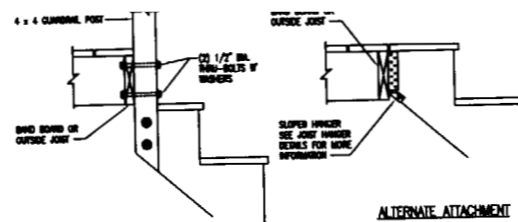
STAIR STRINGER CONNECTION DETAIL
